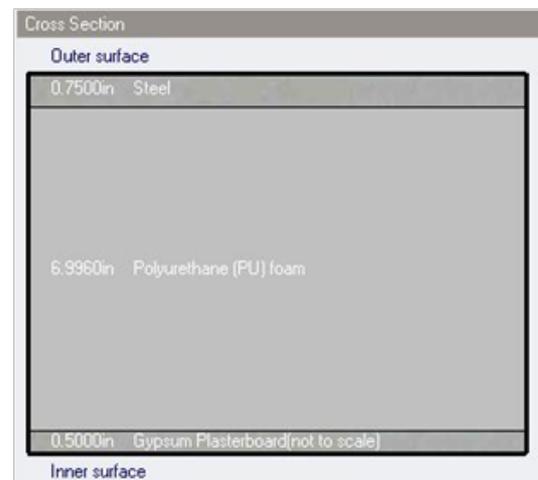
Cross section of SH exterior walls.
